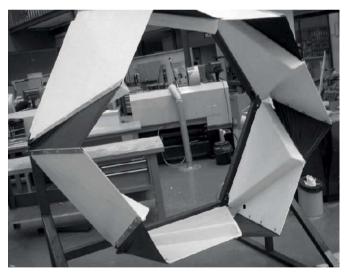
full-scale model of 'Cracker box' façade
